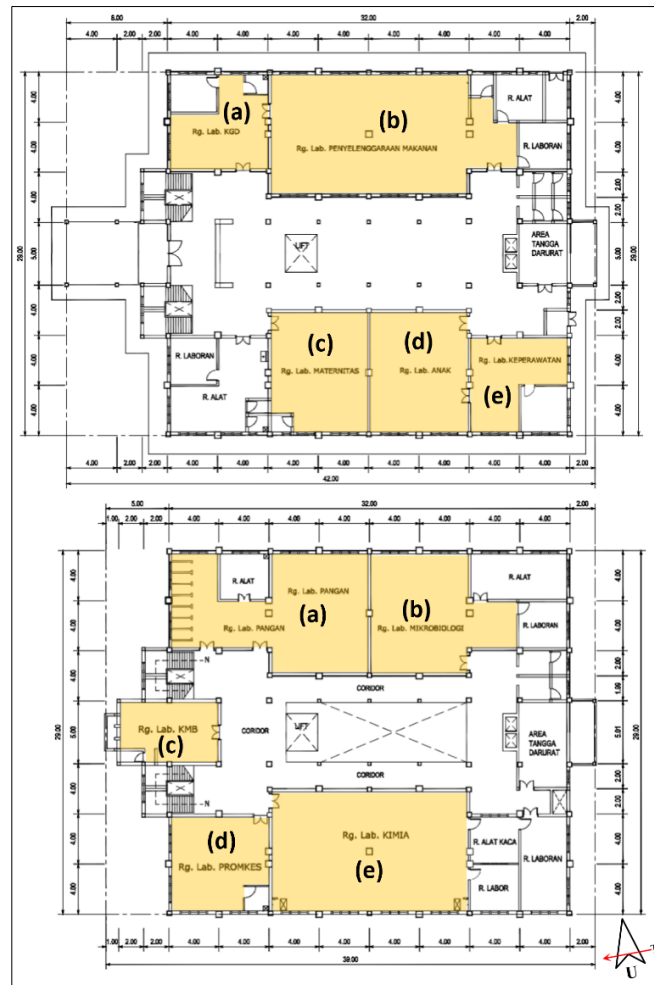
Floor plan of level 1 & 2 of the Poltekkes Riau laboratory (source: author)
